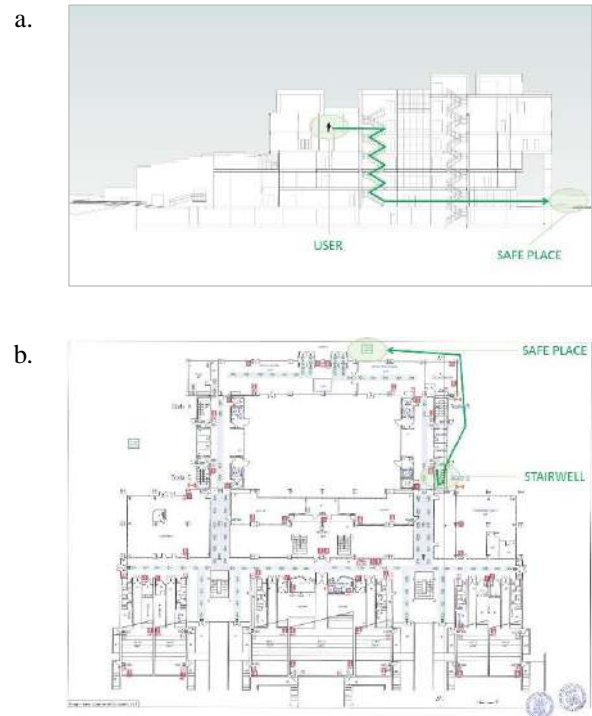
Example of exit route according to the Eustachio's emergency plan: section view (a.) and ground floor plan view (b.)
